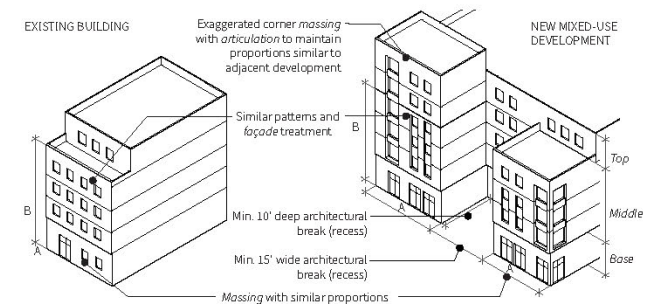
Design the street facade to be proportional to the form and scale of surrounding developments.
